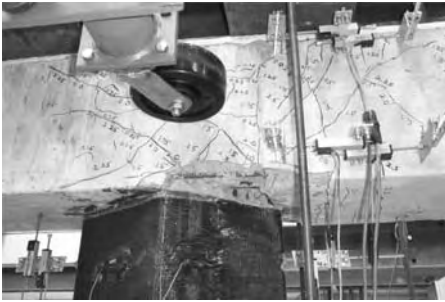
Beam-column failure of the retrofitted specimen.
